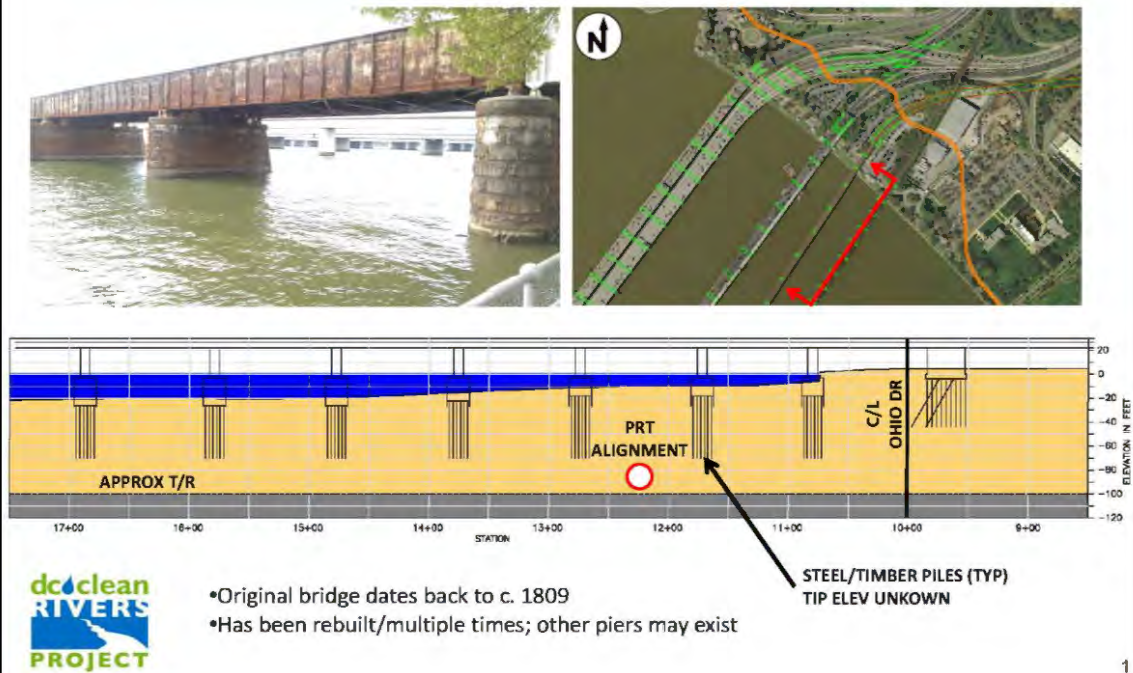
Conceptual Tunnel Cross Section Long Bridge Crossing
